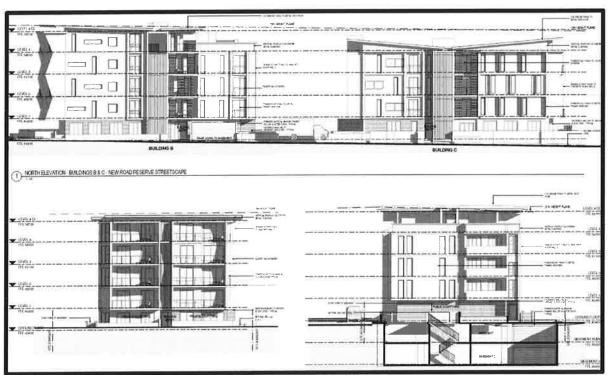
North Elevation Building B and C & East/West Elevation Building B
